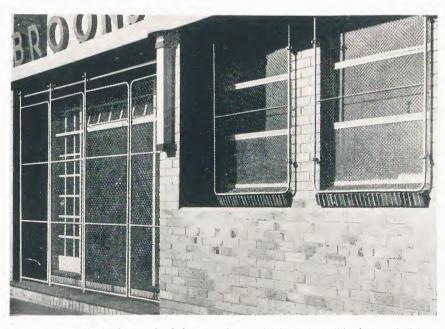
Chuck door and window guards completely protect this factory building against stones and loiterers.
